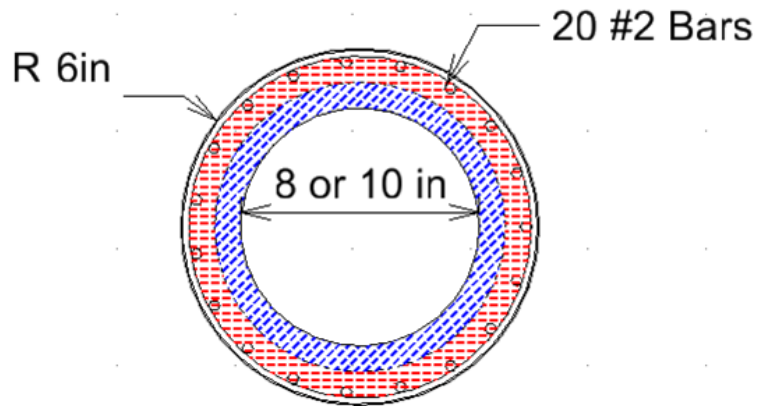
General Section Model for Tested Hollow Circular Specimens
